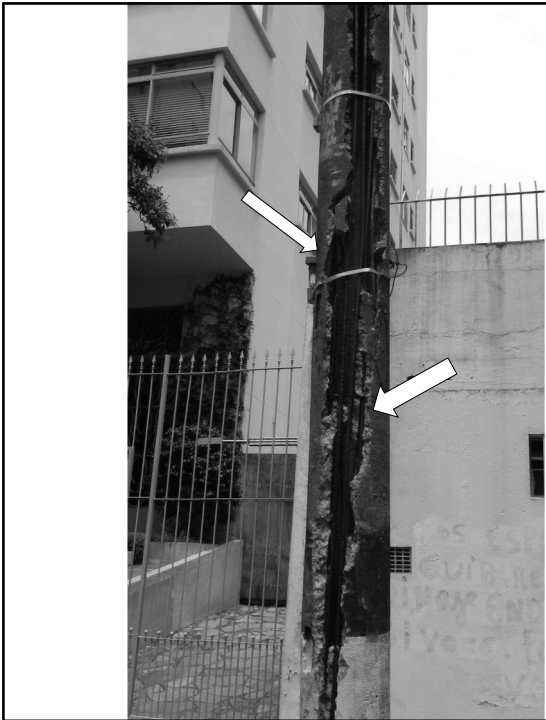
Typical cracking and spalling at parking garage columns
